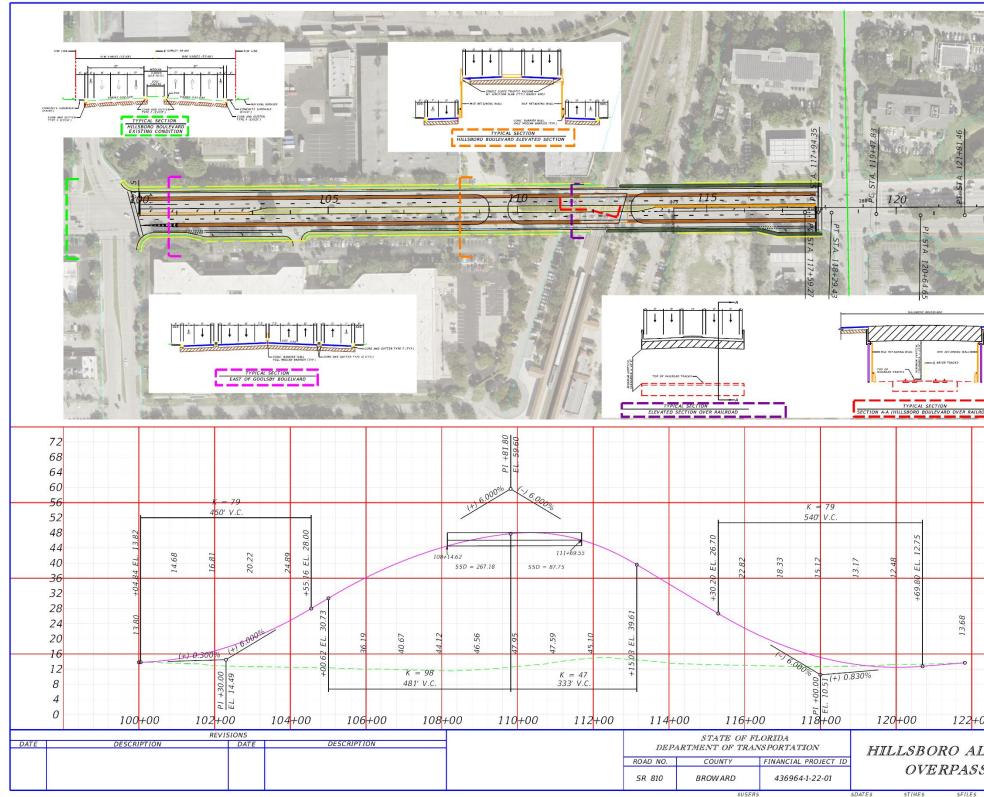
Hillsboro Boulevard – Concept Plan – Alternative 2
